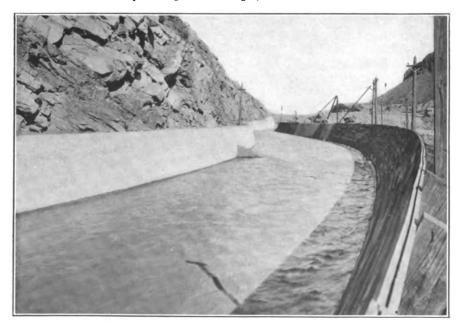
Fig. D.—Temporary diversion channel at Elephant Butte dam, looking upstream. See also Plate III. Fig. D.
